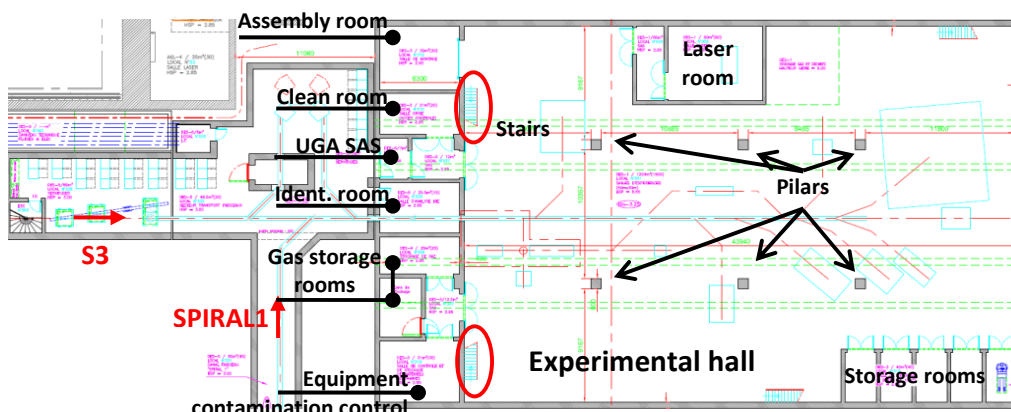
Schematic view of the main floor of the DESIR hall (-3.25 m).
